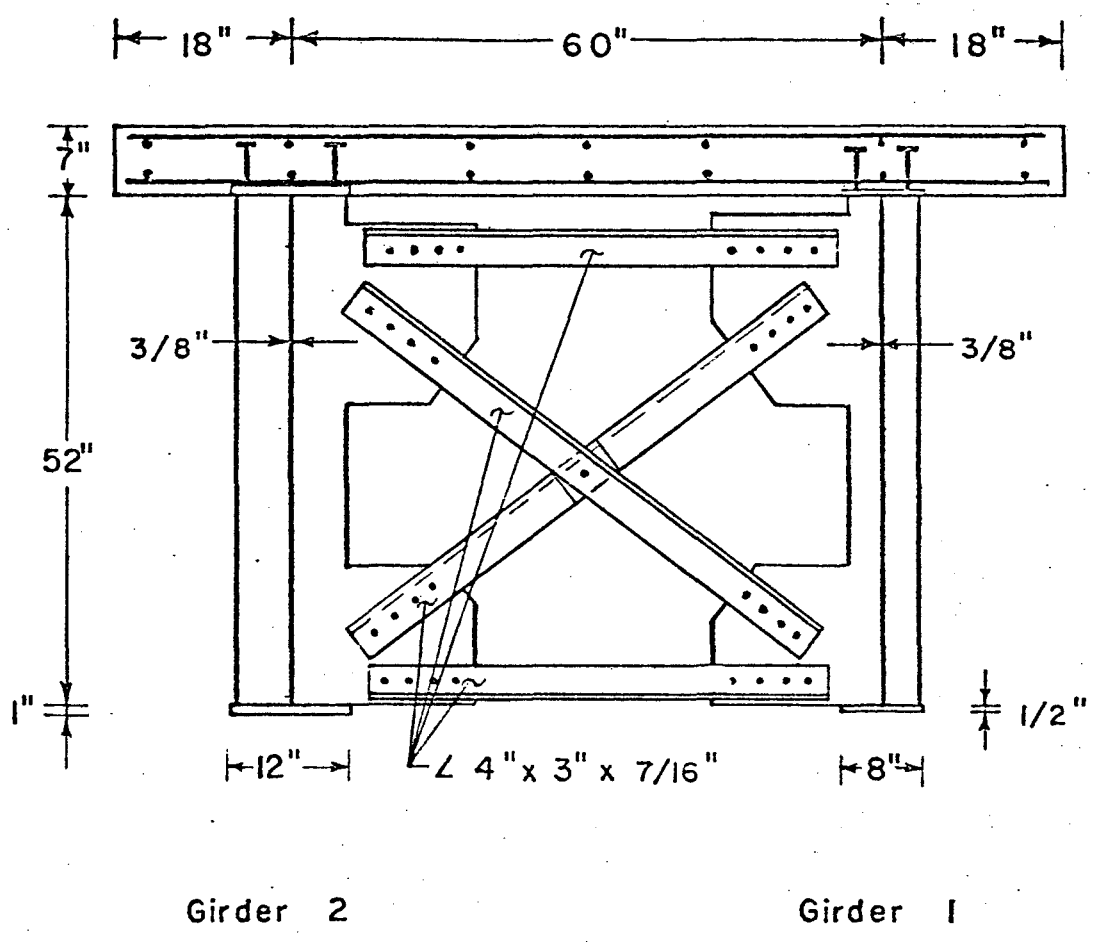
Typical Diaphragm Section of Composite Assembly 5
